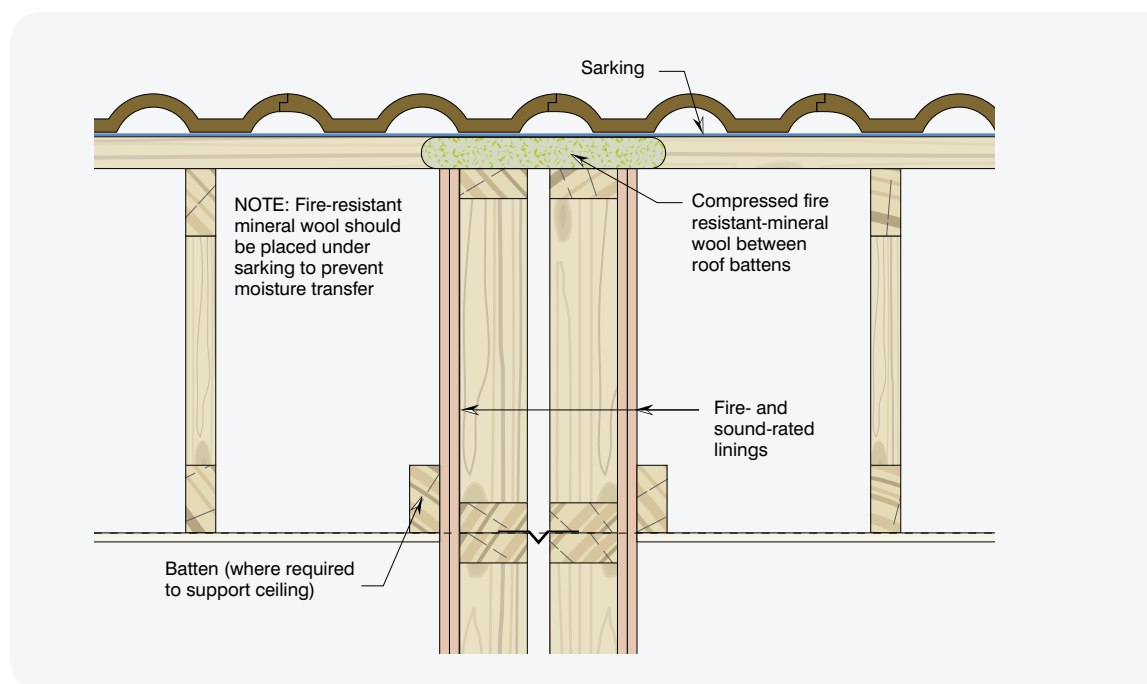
Fire- and sound-rated wall through to the underside of the roof – FRL 90 minutes – elevation view.
